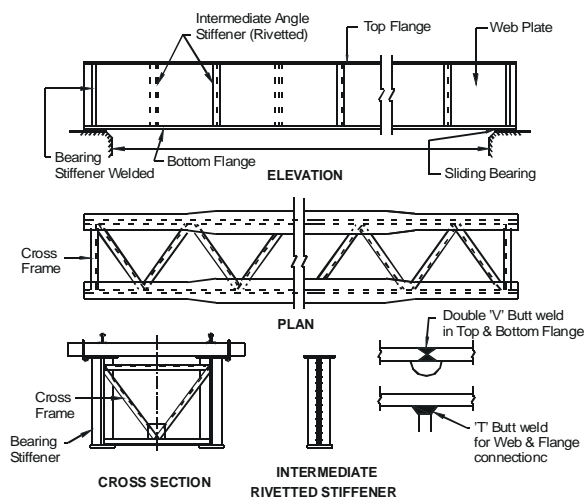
12.2 m SPAN (WELDED PLATE GIRDER)
